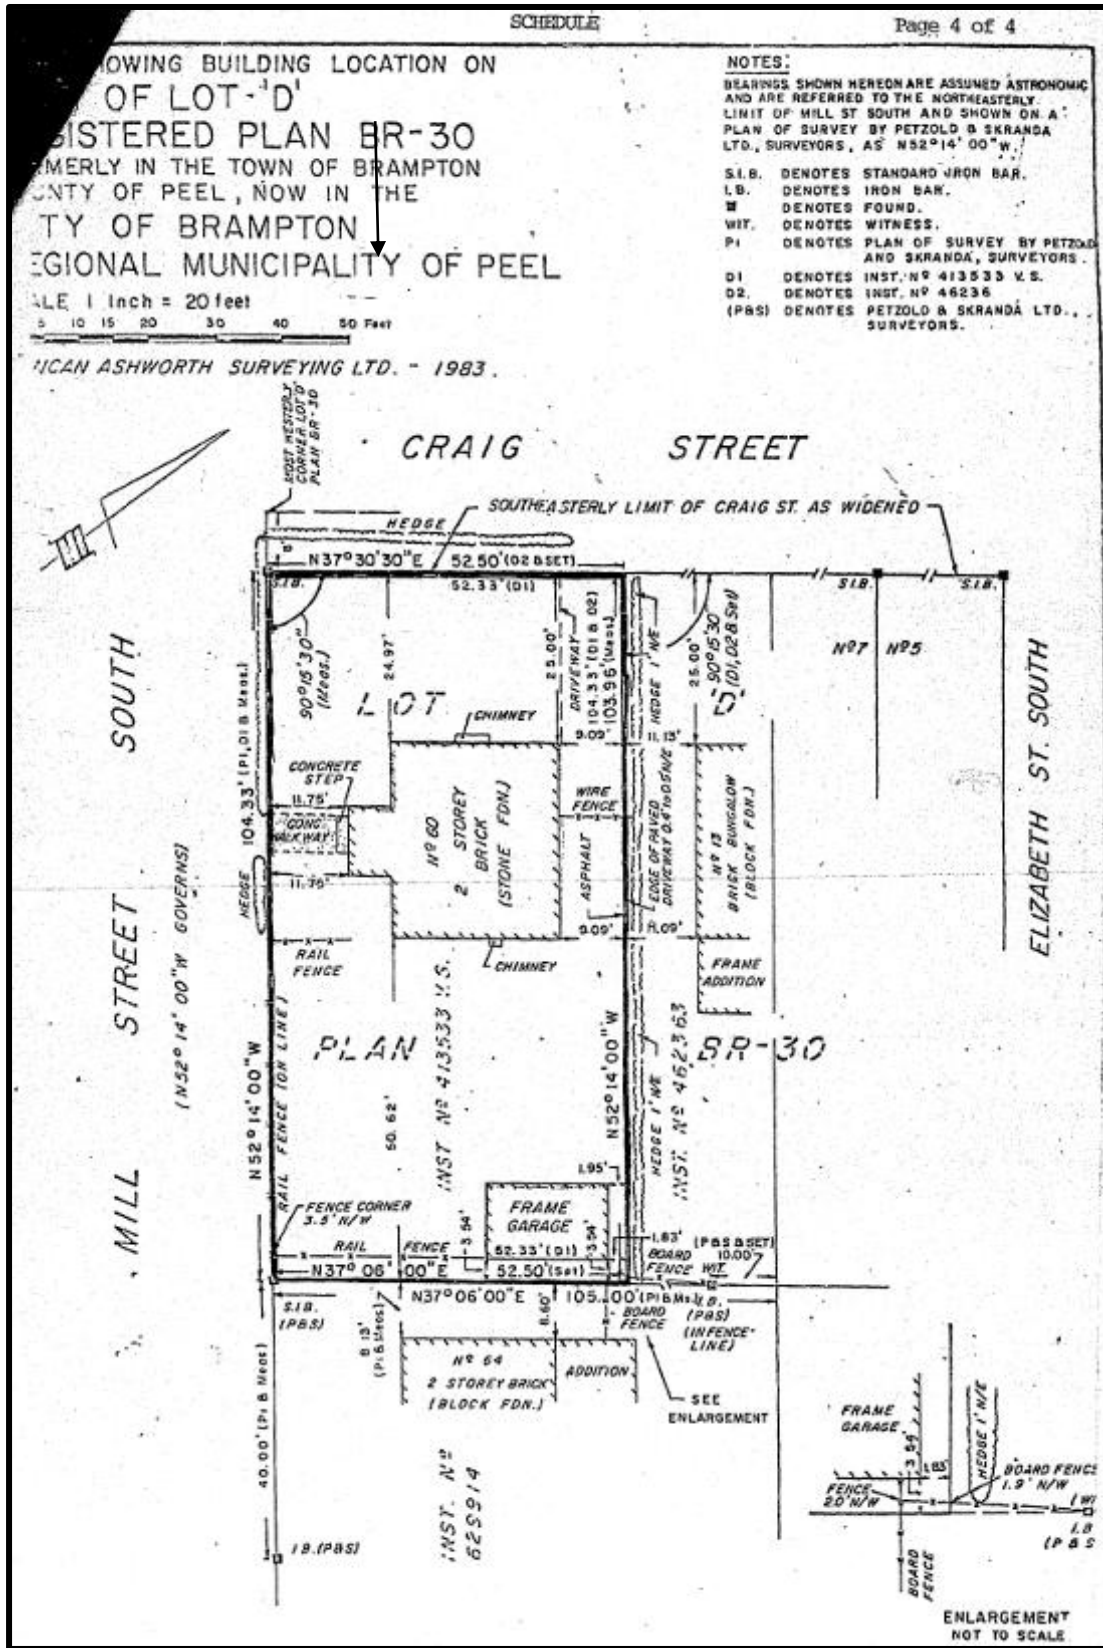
Subject Property Shown on a Plan Showing the Building Location, 1983 (LRO 43, #725143)
